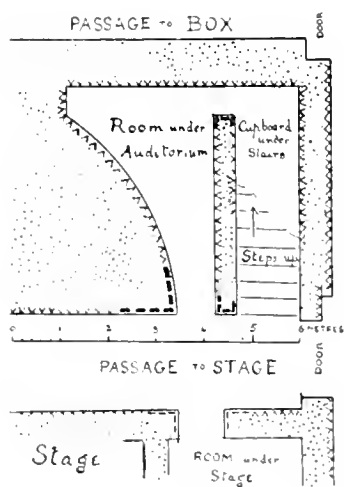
PLAN OF STRUCTURES SHOWN IN FIG. 17.
